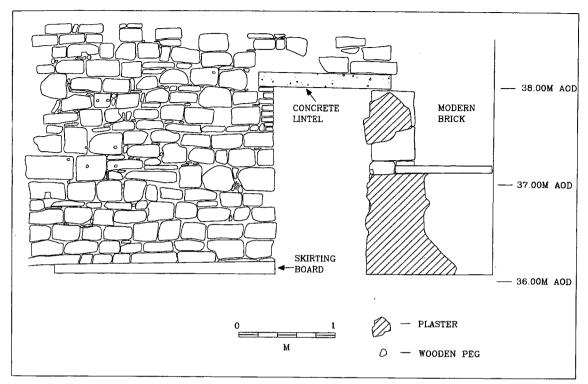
Alderman Fenwick's House: Ground Floor Rear Stone Wall.
